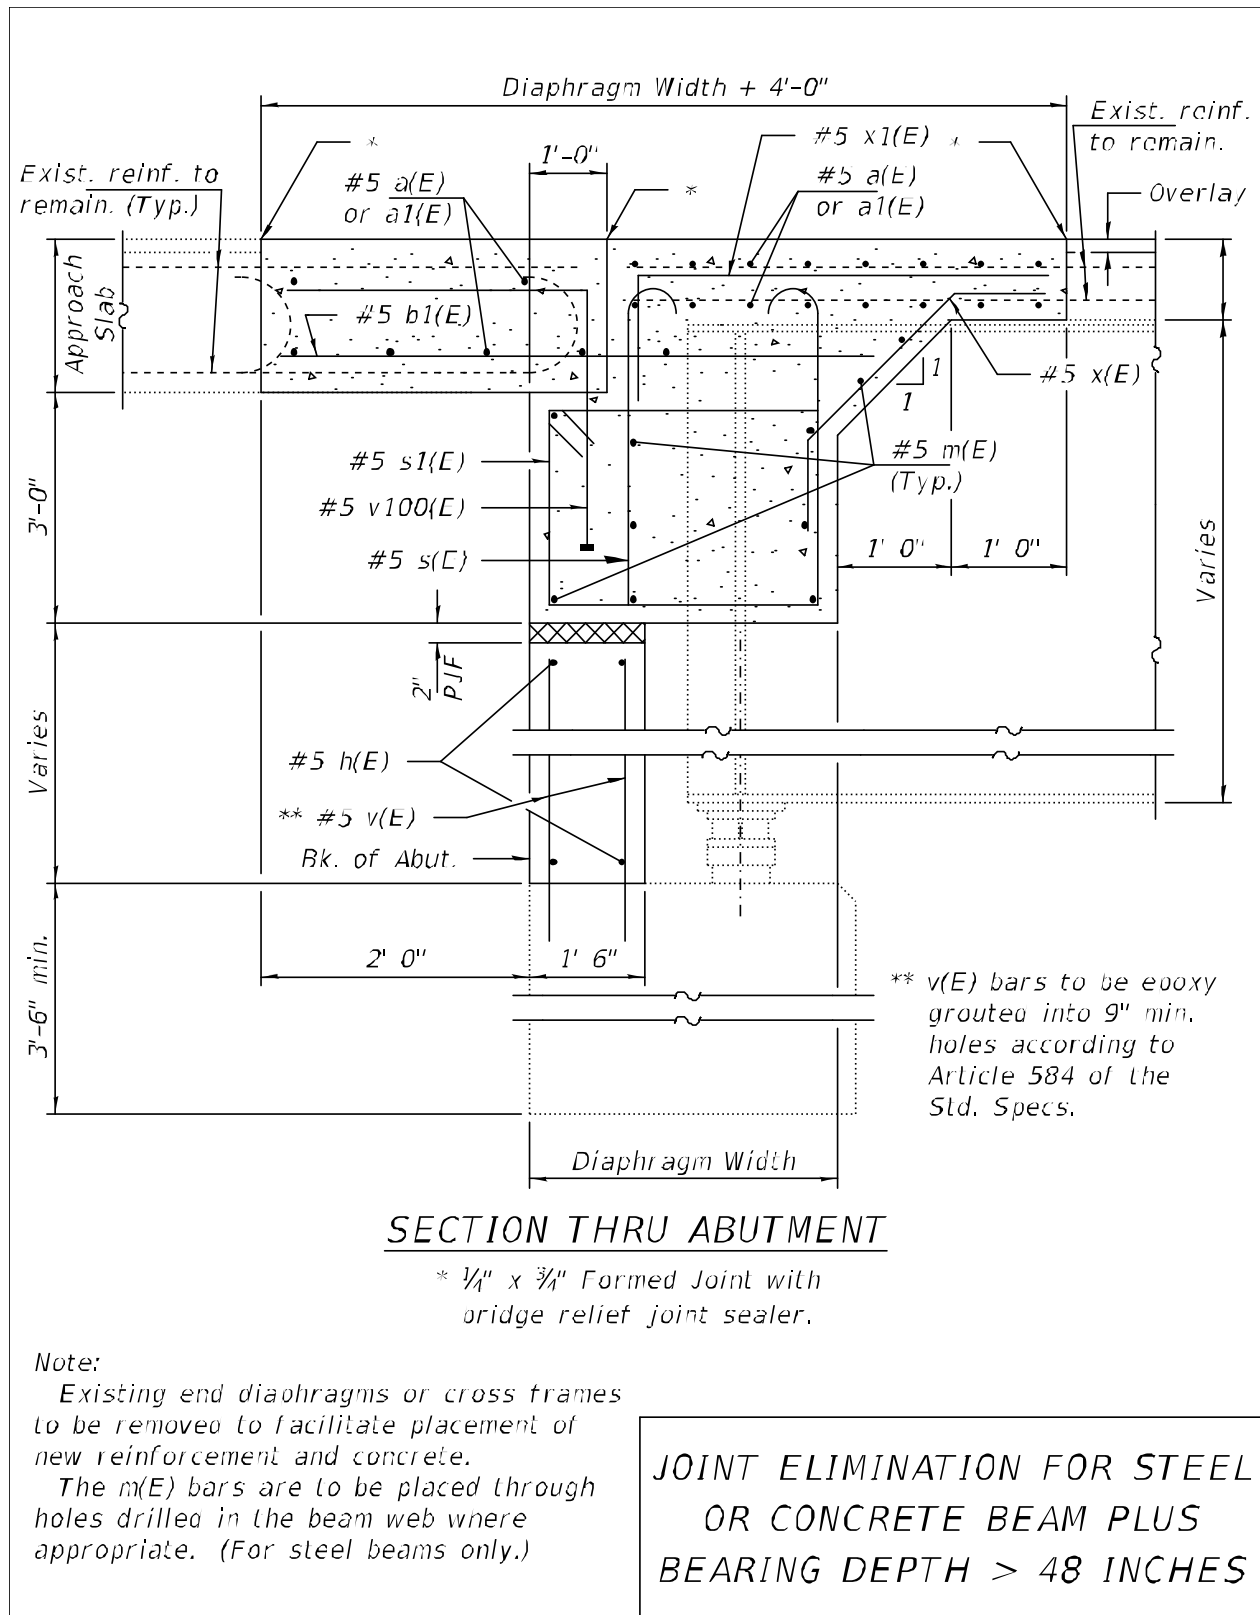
Joint Elimination for Steel or Concrete Beam Plus Bearing Depth > 48"
